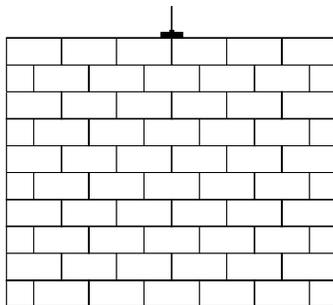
Plain hollow concrete masonry wall (load over two end webs)
